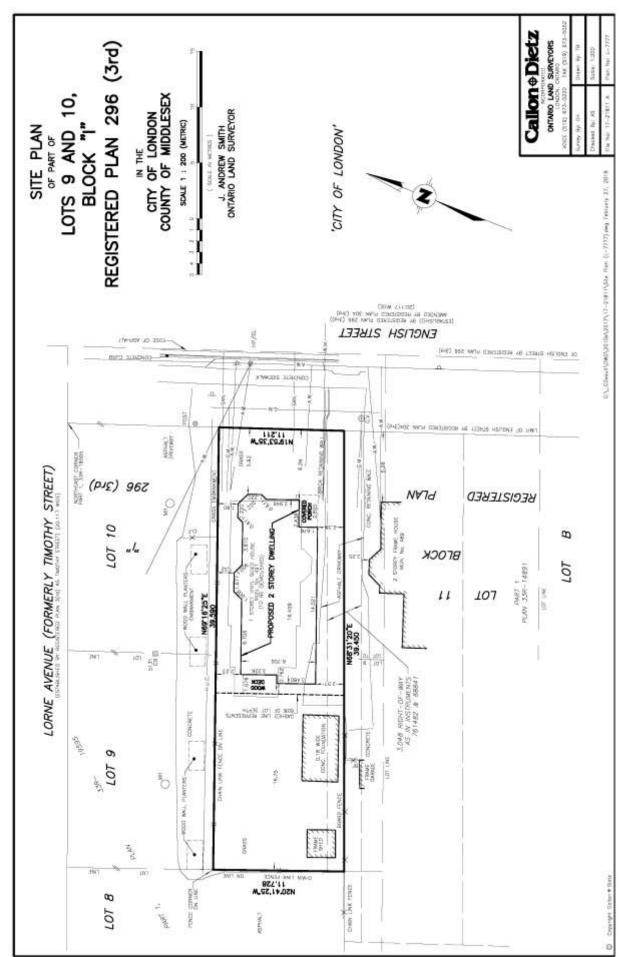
Site Plan showing proposed building at 491 English Street, with its front façade aligned with the abutting property and the street wall of English Street.
